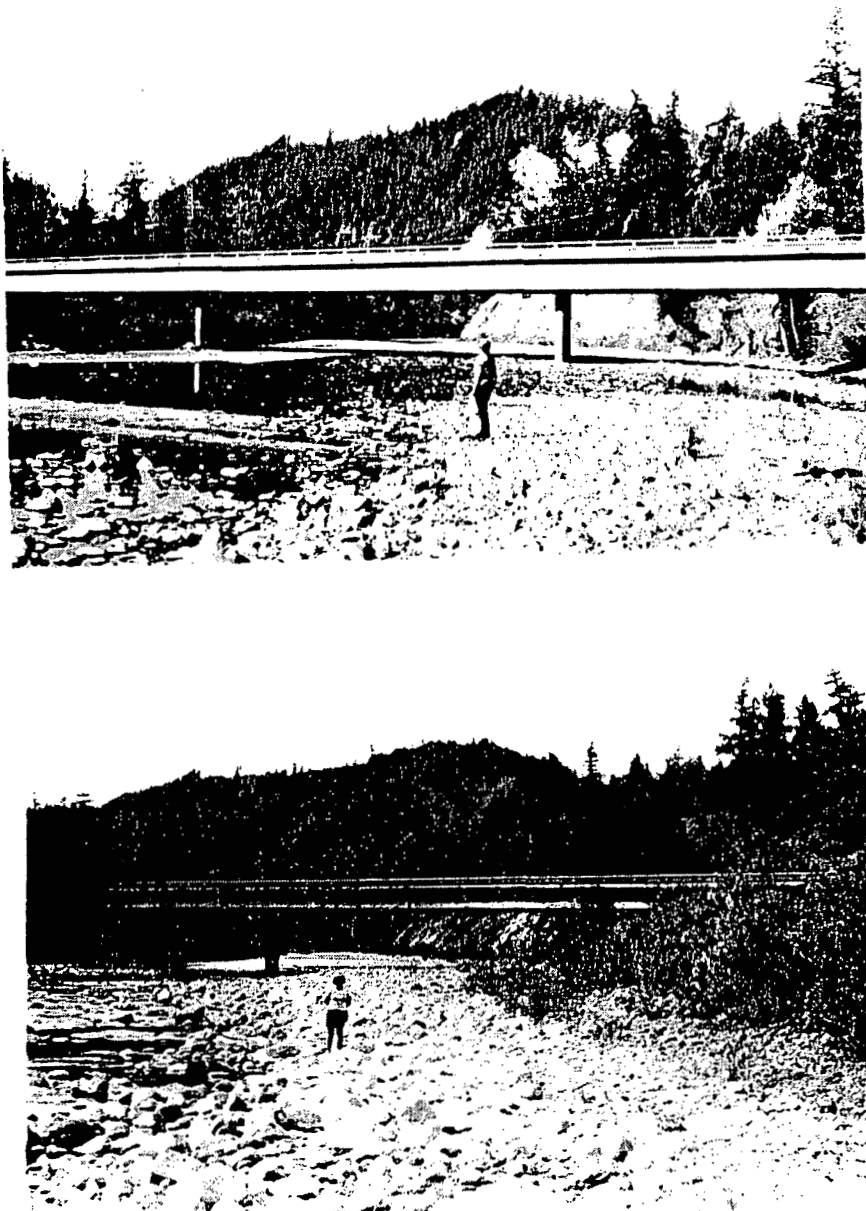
View looking downstream at the Van Duzen River at the site of the former U.S.G.S. gaging station at Pepperwood Falls. a) taken November 1976. b) taken August 1984. The new highway bridge is a replacement for an old concrete arch bridge that was washed away by the 1964 flood. Note growth of riparian vegetation on right bank since 1976. Figure 15 shows changes in the channel cross-section at this site.
